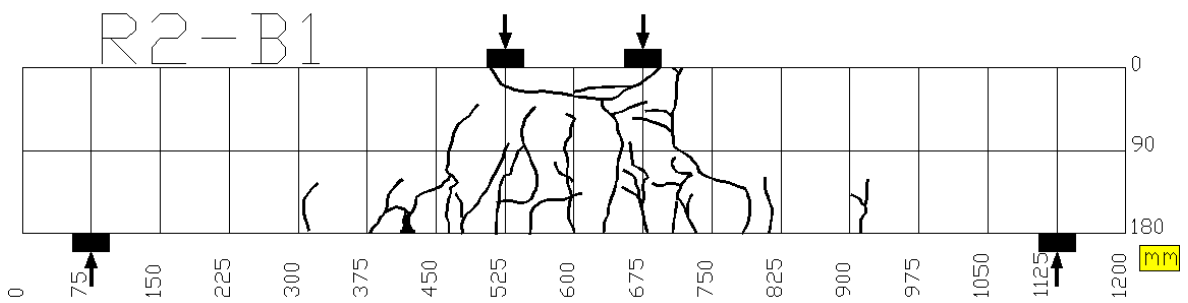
Crack Pattern for Beam (R2-B1) At Failure
